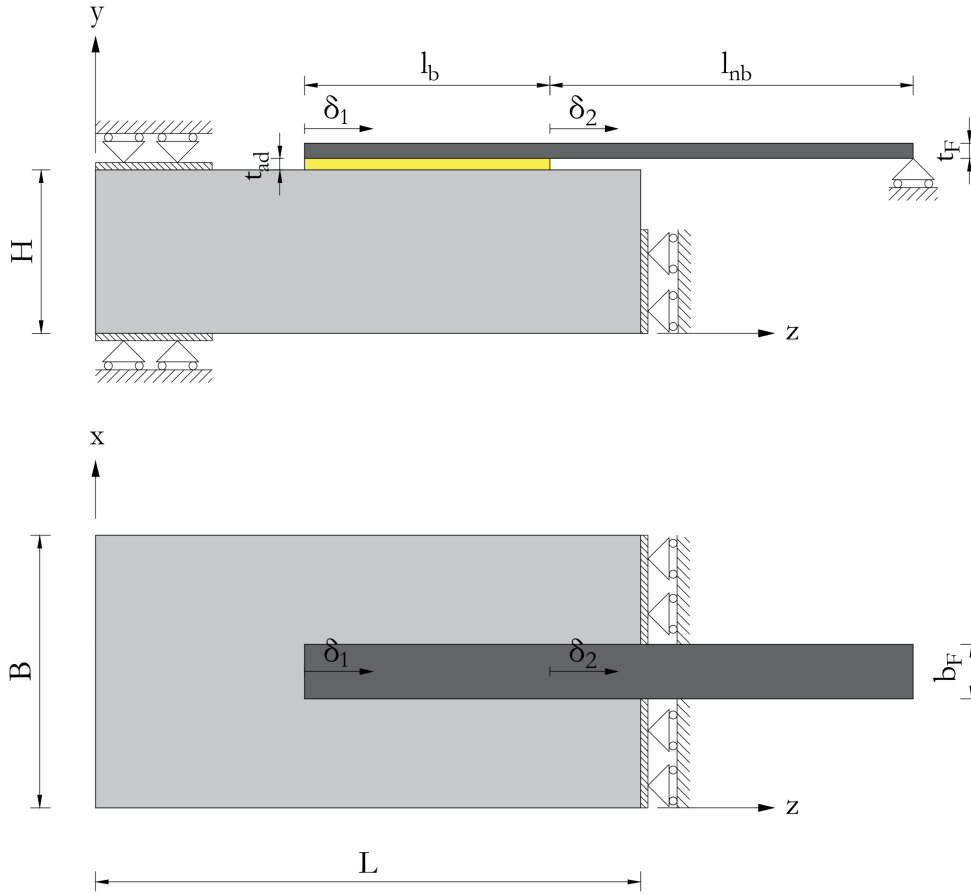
Geometry of the specimen used for the single-lap shear test carried out by Carrara et al. [73]
